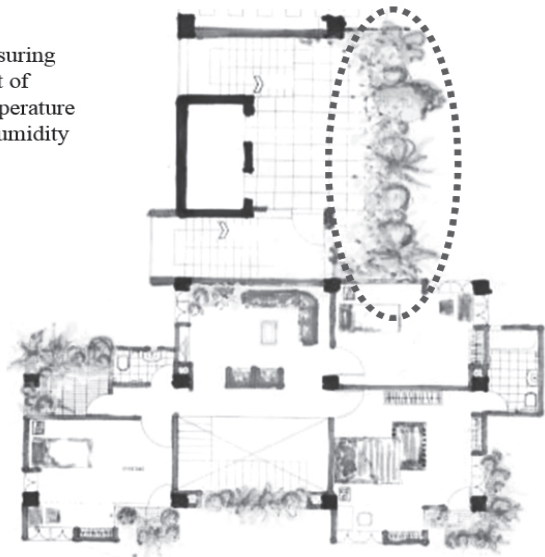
Extensive Green Wall of studied house Case study 03 (Duplex residence02), First floor plan Source: Developed by Author
